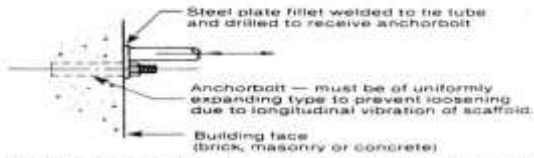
Anchor bolt tie. Vertical or horizontal section through wall where no openings or members are available for tying to.
